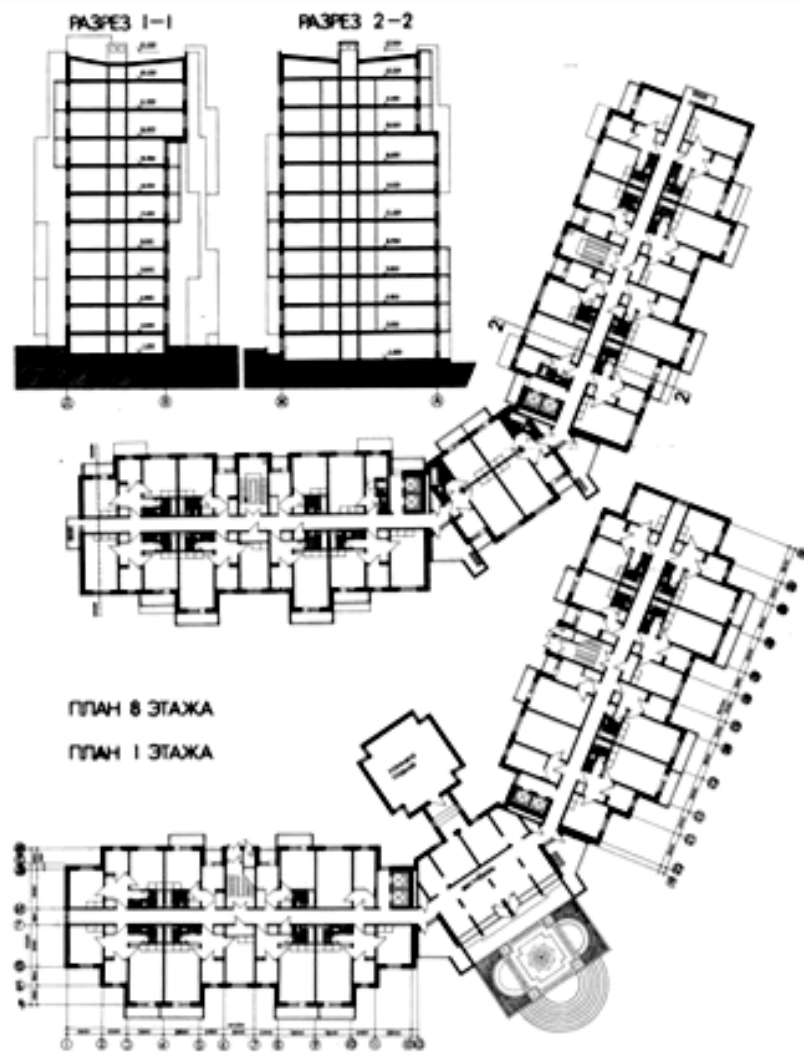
Residential building on the south of Soviet Street. Plans and sections.
